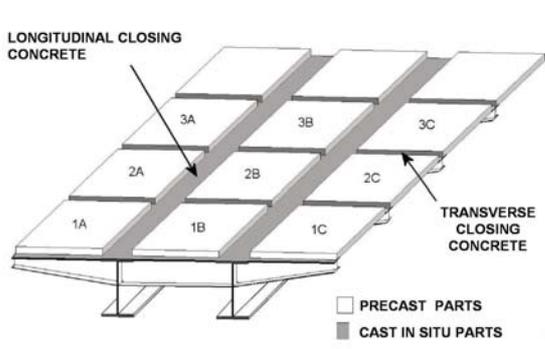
Precasting/In-situ casting distribution for a twin girder deck with directly supporting cross-beams and cantilevers
